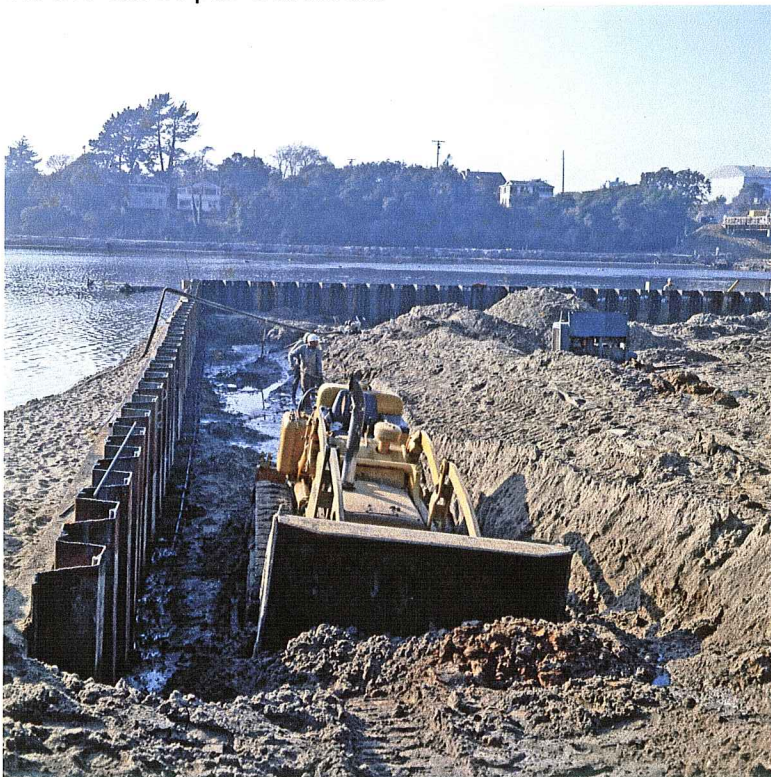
Sheet Pile bulkhead for the Boat Repair Dock. Excavating for tiebacks.
